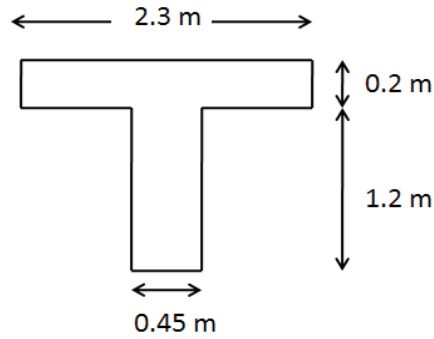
T-section Concrete Beam Designed for the Bridge Superstructure with 17.5 m Span
